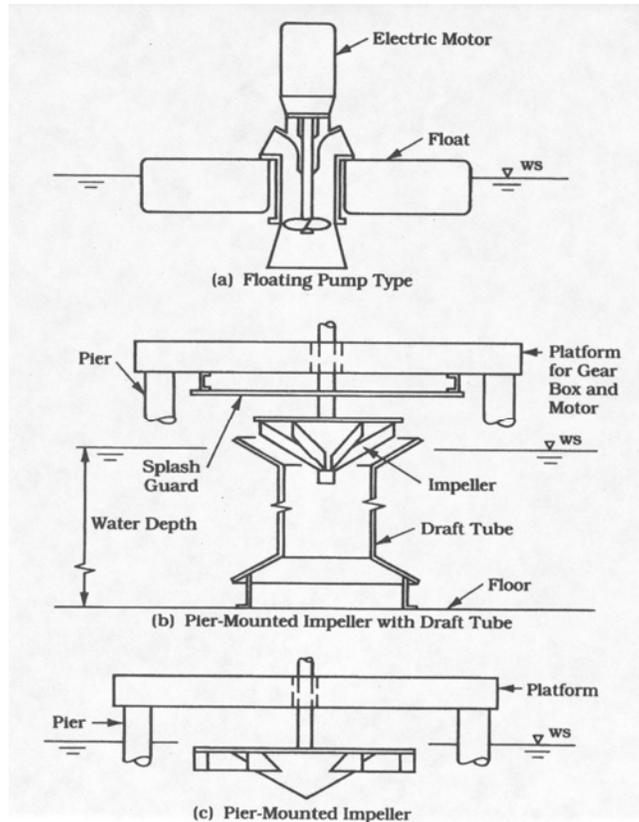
B. Floating pump, pier-mounted impeller with draft tube and pier-mounted impeller (Reynolds and Richards, 1996).
